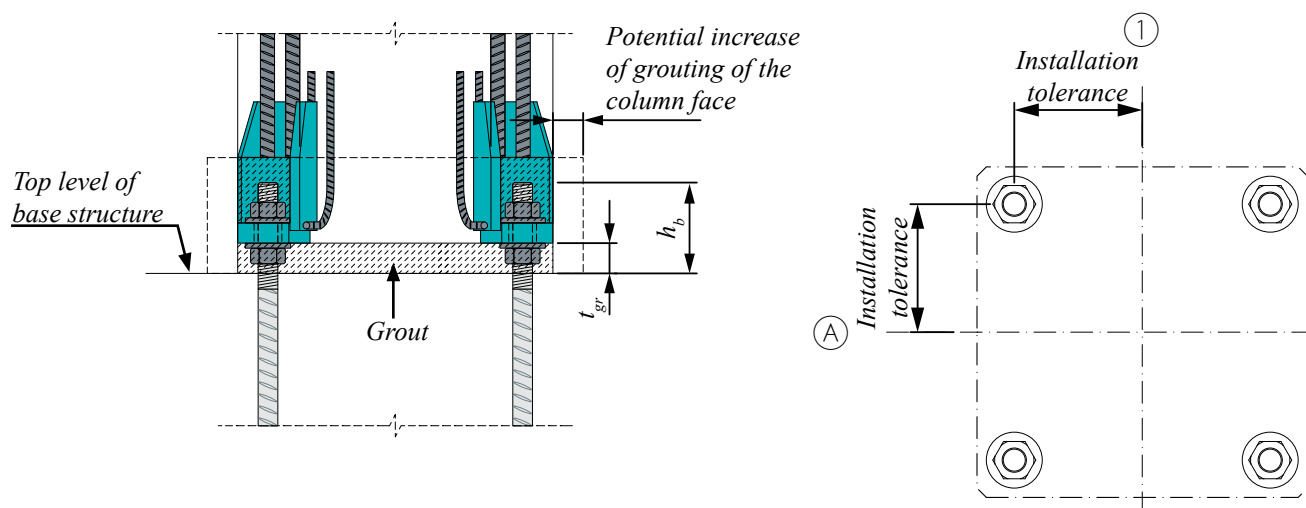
The anchor bolt's protrusion from the surface of concrete and installation tolerances when HELKA® Column Shoes are used.
